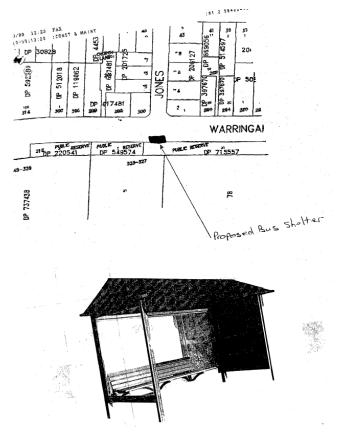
Shelter H2 DA3062 Submitted Site Plan
